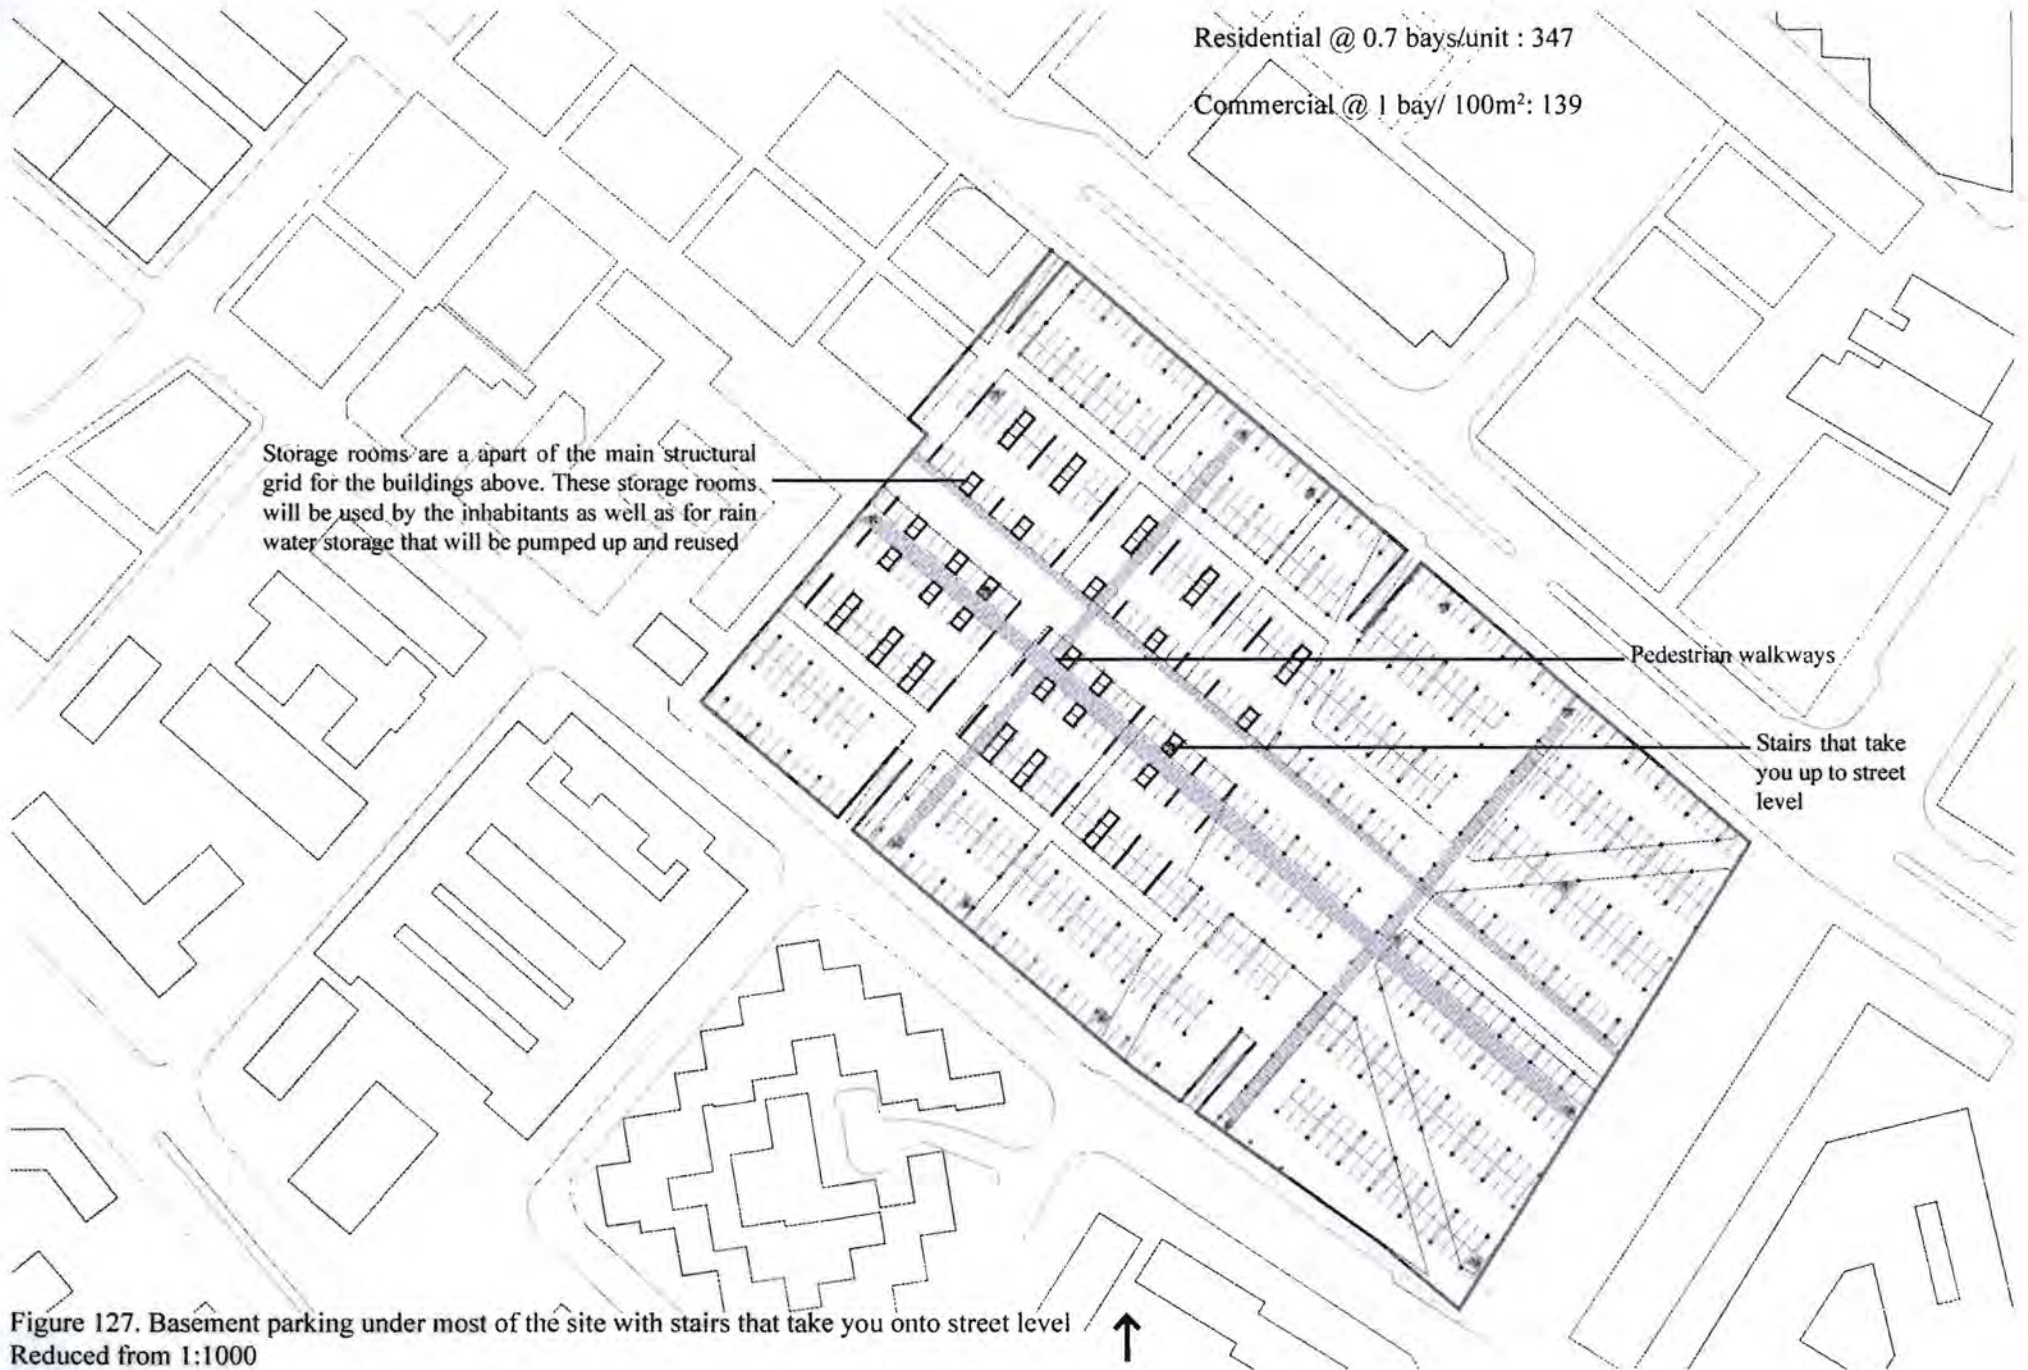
Basement parking under most of the site with stairs that take you onto street level
